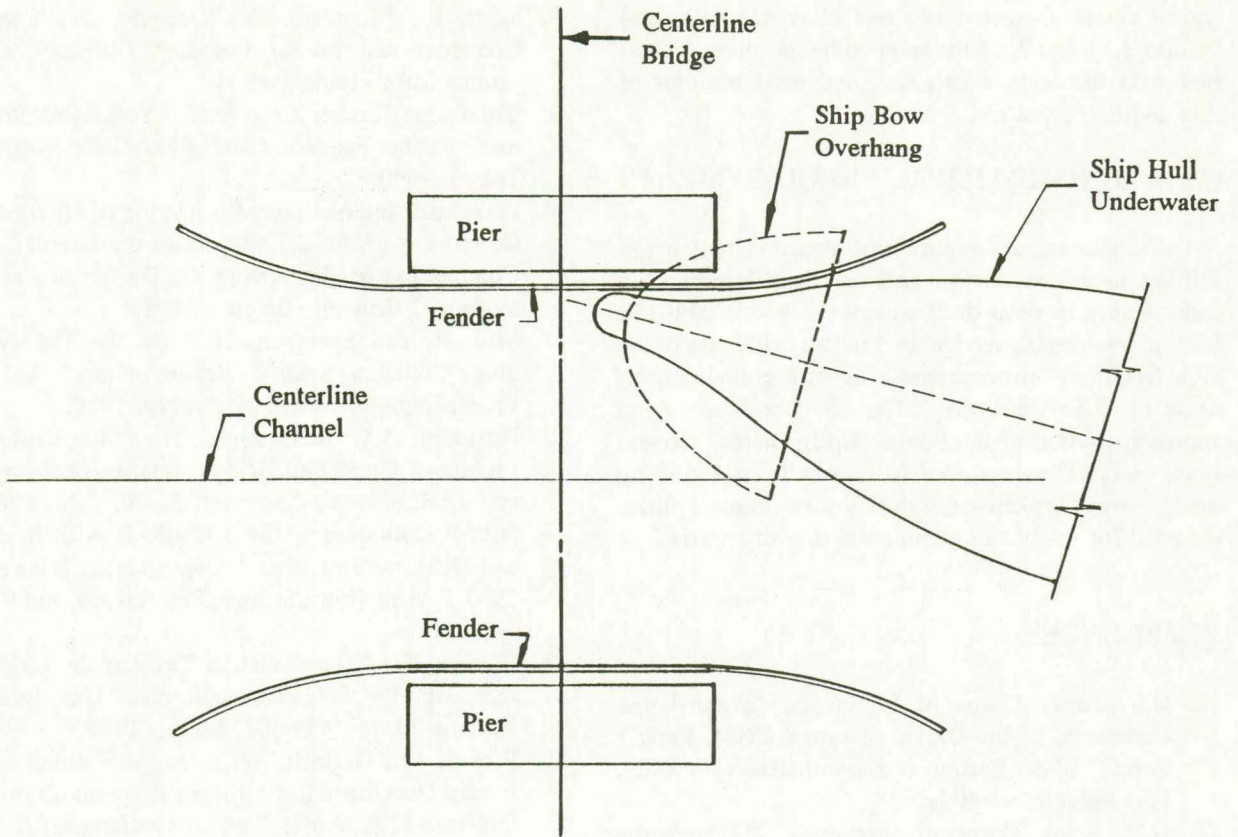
Plan of Ship Bow Overhang Impacting Pier Behind Fender.
